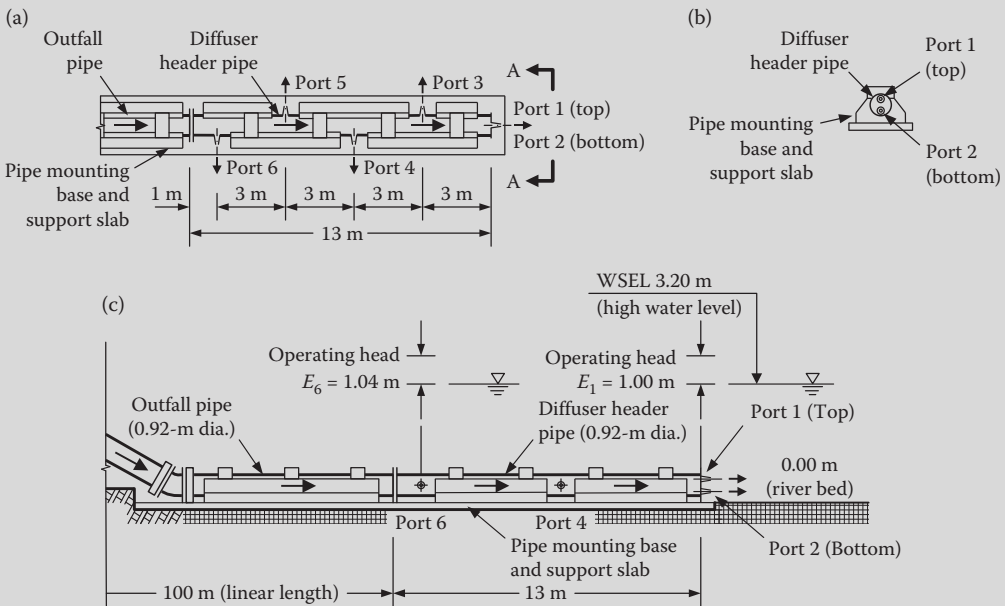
Design details of diffuser pipe: (a) plan view, (b) Section AA, and (c) side view (Example 12.41).
